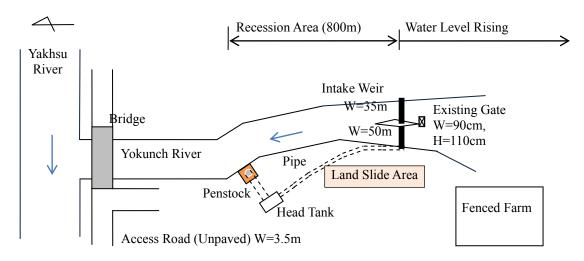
Power Facility Plan at Yokunch Site
